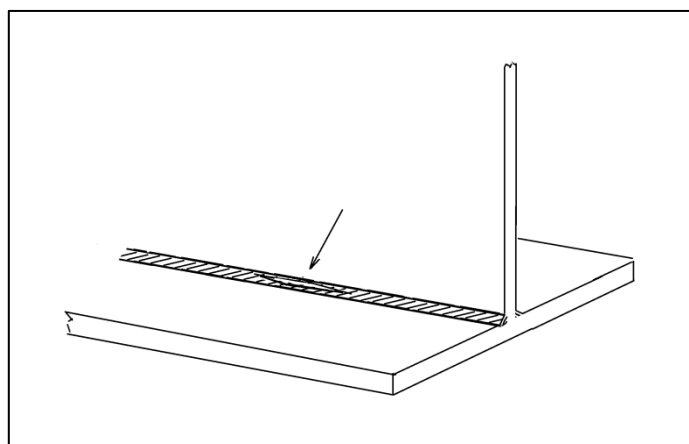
Illustration of fatigue cracking mode E, which is initiated in the longitudinal weld between the web and the flanges.
